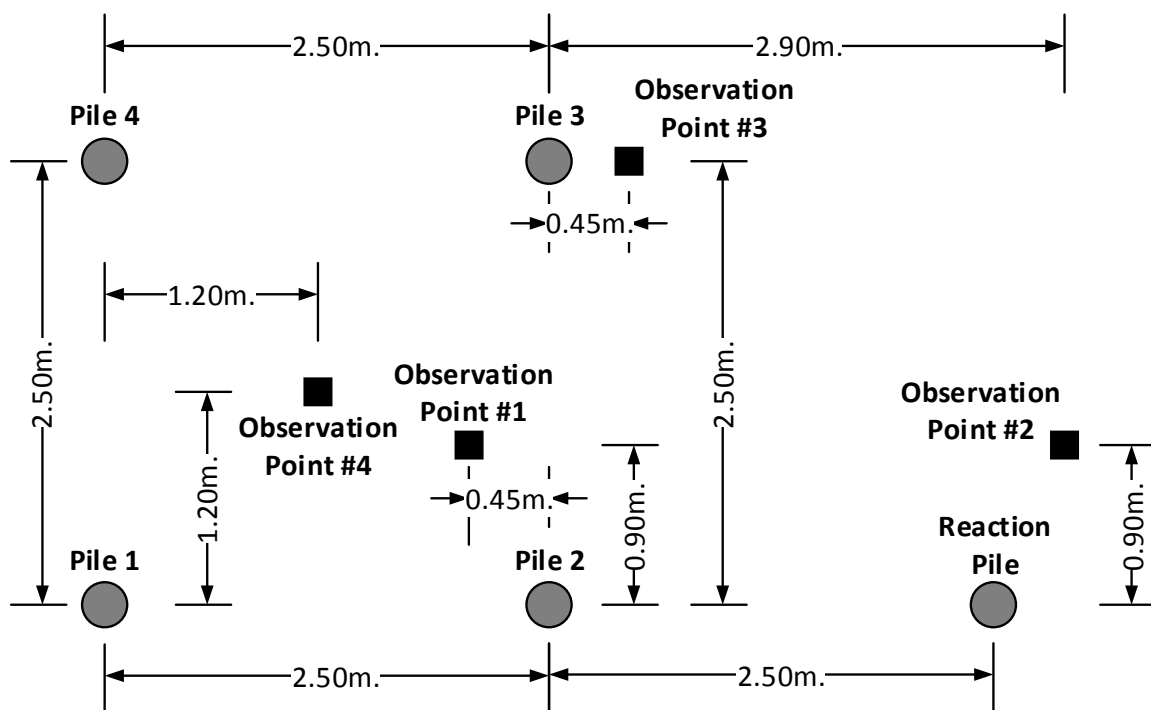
Plan view showing the spacing and locations of the energy piles and observation wells.
